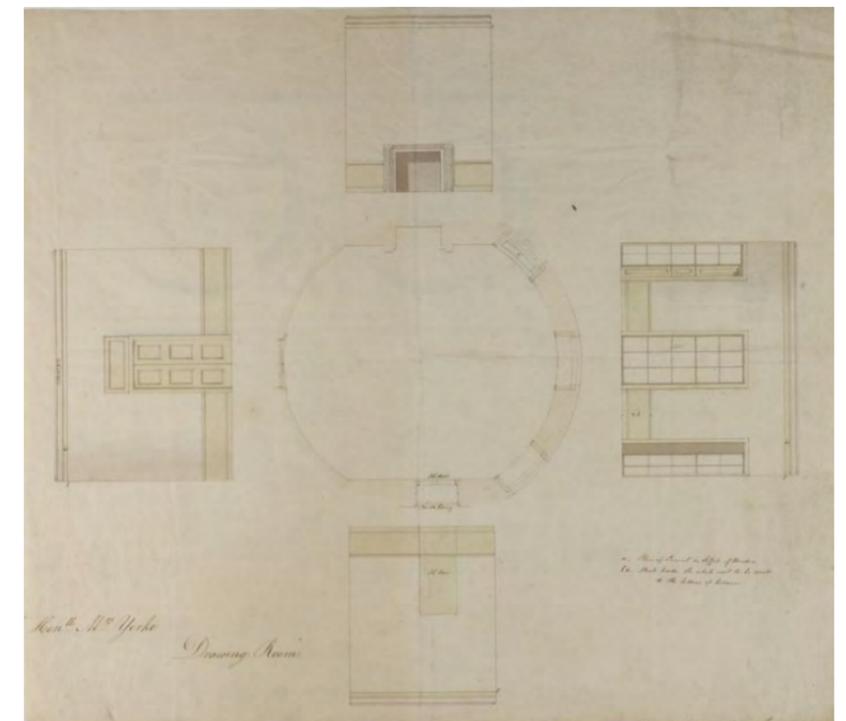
Soane's plan and internal elevations for the circular drawing room on the ground floor, dated 1794.
